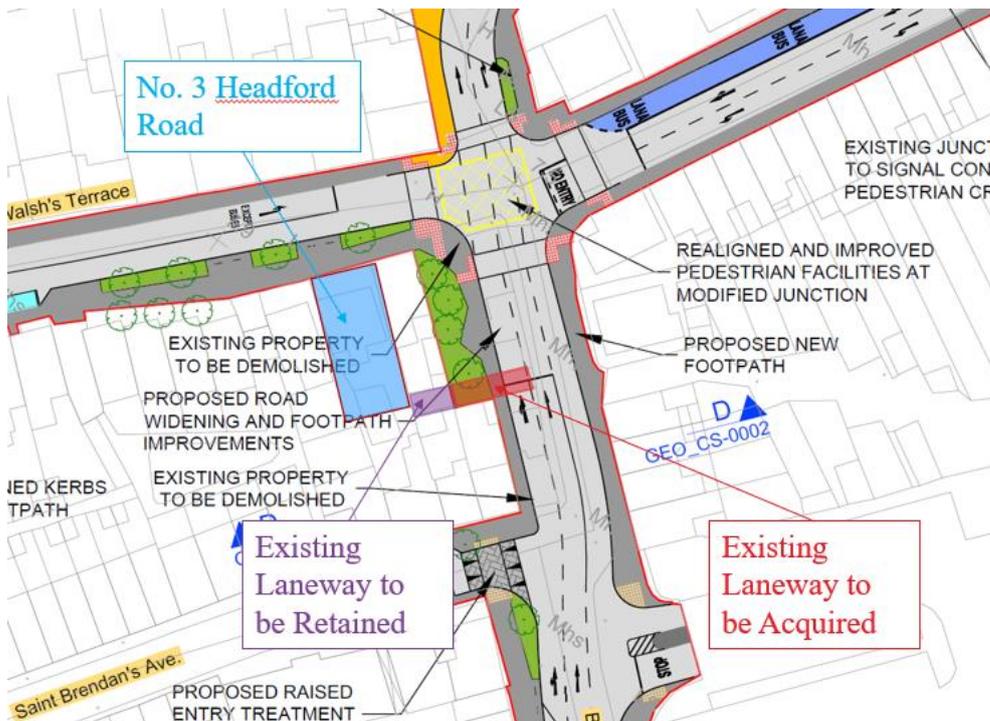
Retained Laneway at No. 3 Headford Road
